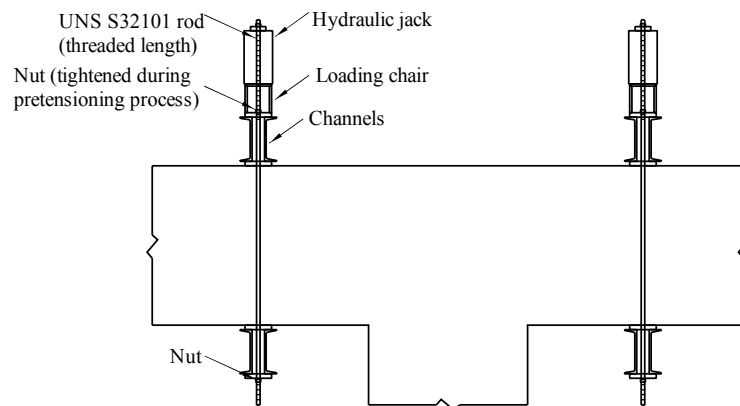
Components of the pretensioned clamp system installed on a bridge pier cap
